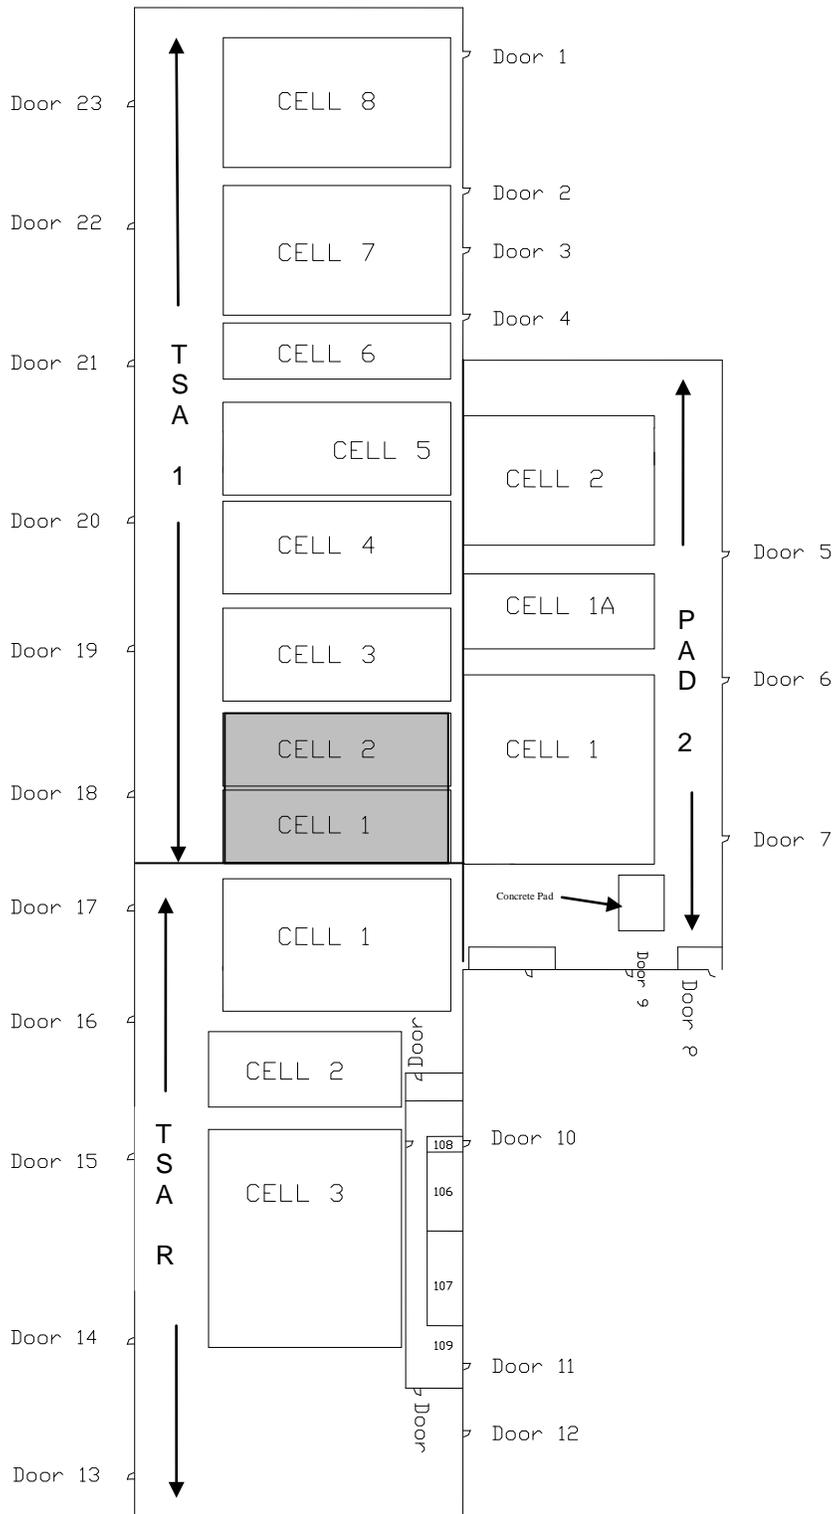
TSA-RE Original Floor Plan, showing location of remaining waste in Cells 1 and 2 of TSA-1.
